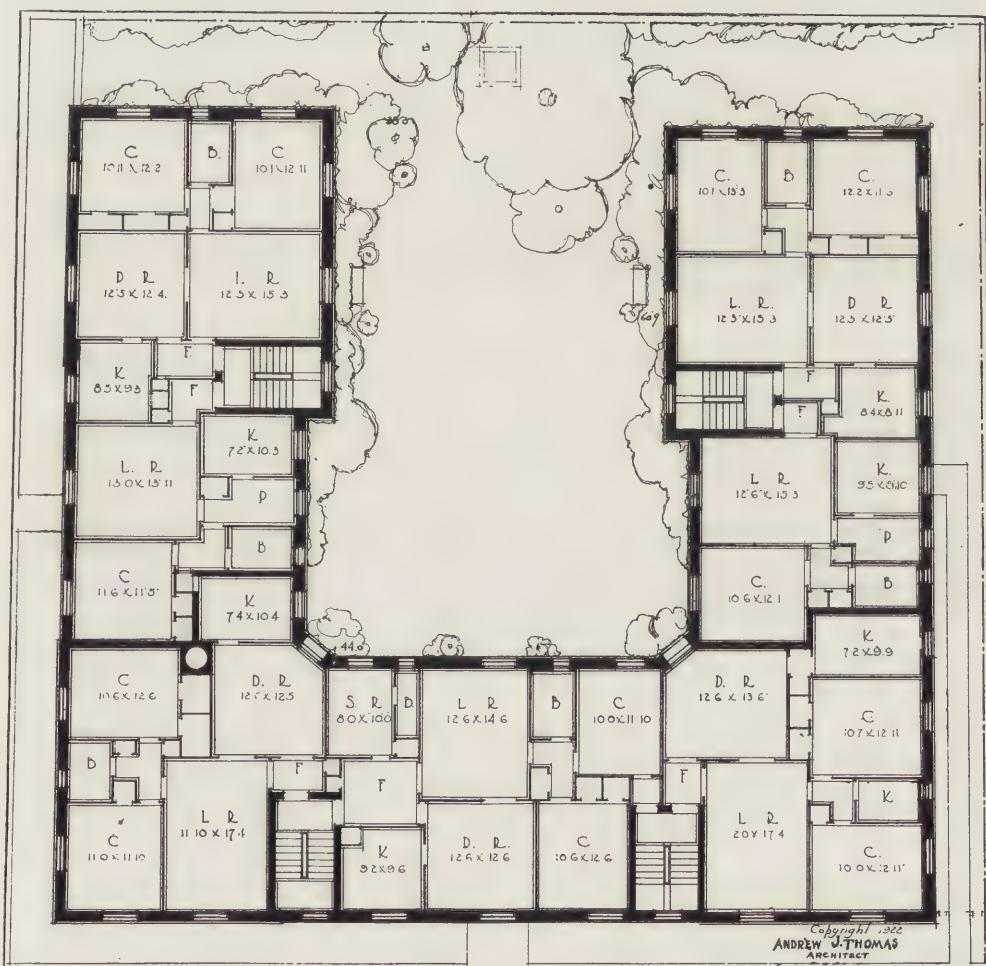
TYPICAL FLOOR PLAN OF APARTMENT HOUSE, 190TH STREET AND MORRIS AVENUE, NEW YORK CITY.
